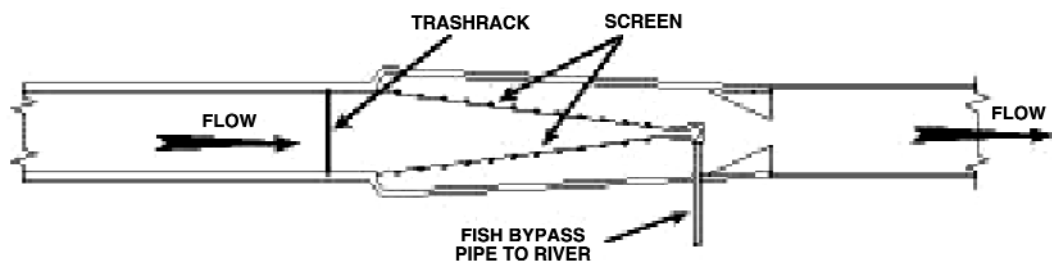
Plan Elevation of Vertical Fixed Plate Screen (WDFW, 2000)
